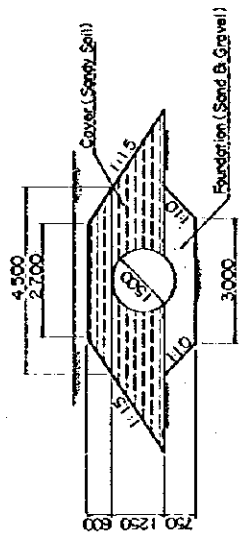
TYPICAL DRAINAGE STRUCTURE
